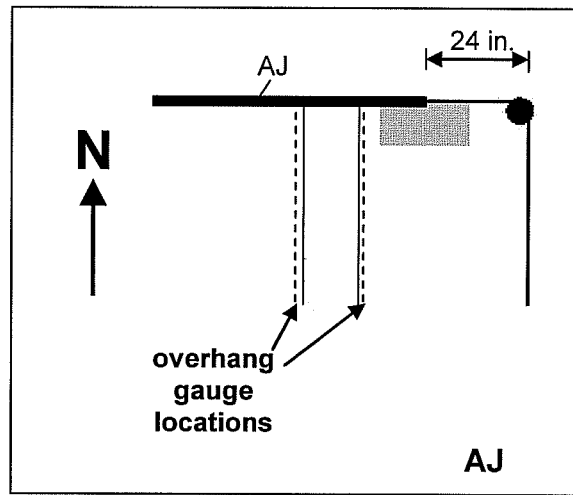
Overhang Test Area 4, AJ and 6 in. top reinforcement spacing
